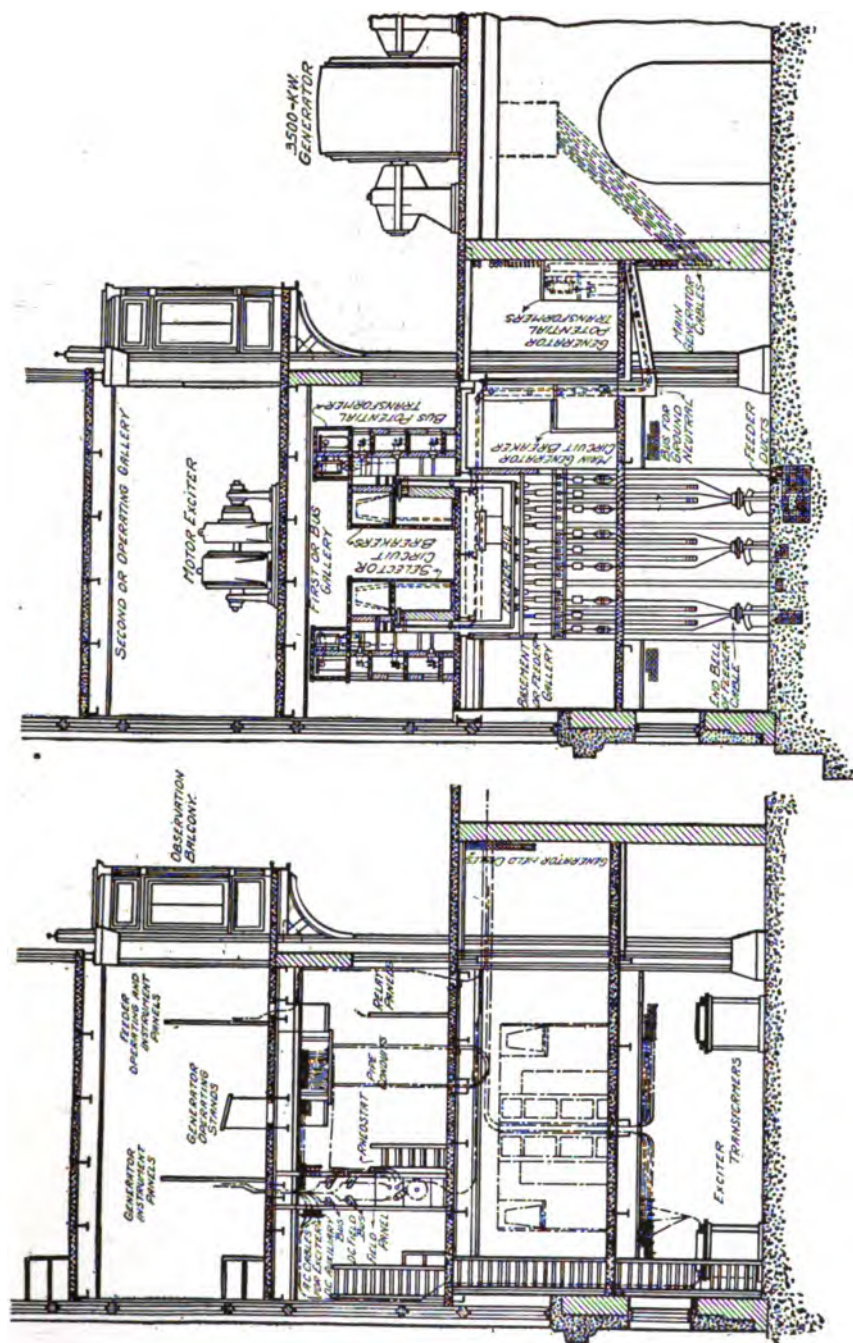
Sections through Switch Galleries, Long Island City Plant.
